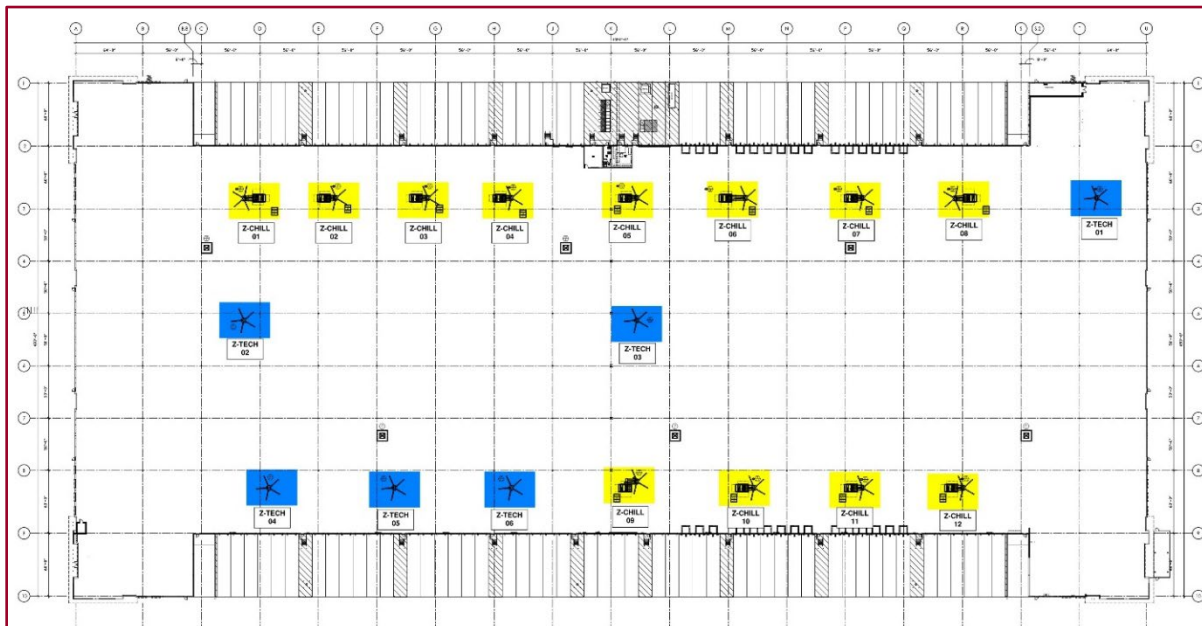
Wesco Distribution Center Floor Plan – Z-Chill™ and Z-Tech™ Locations
